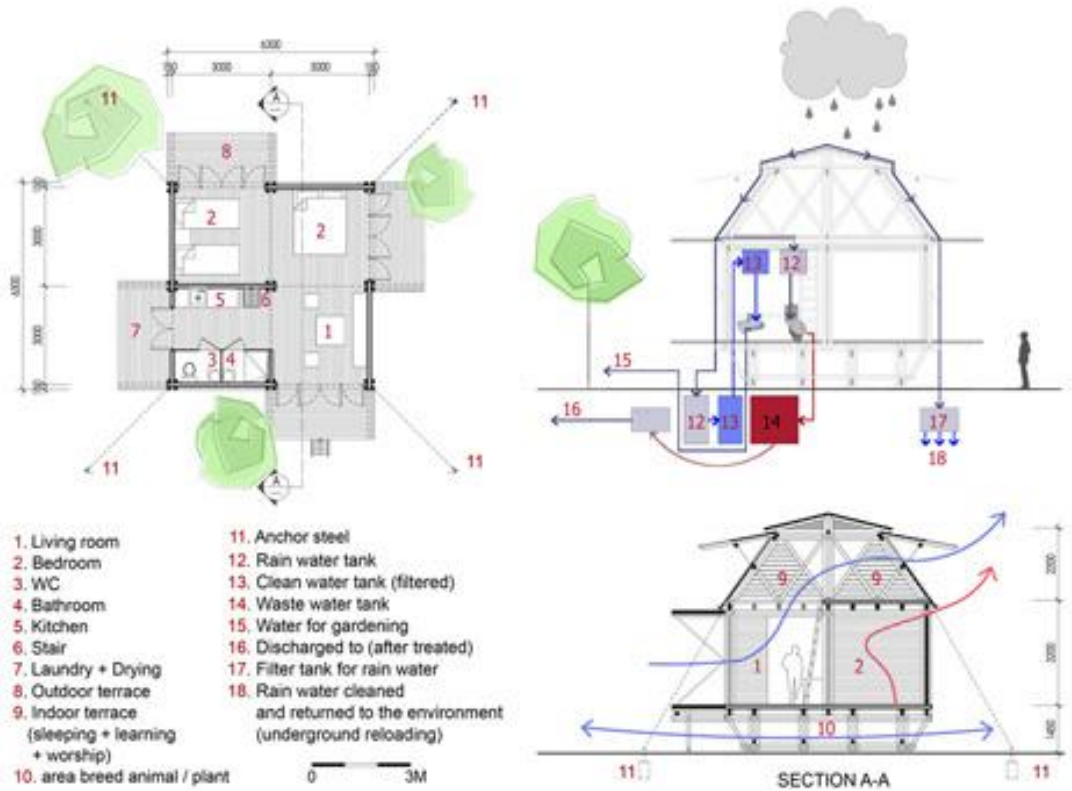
Drawings of Blooming Bambu House. Source. Davis,A. (2013)
